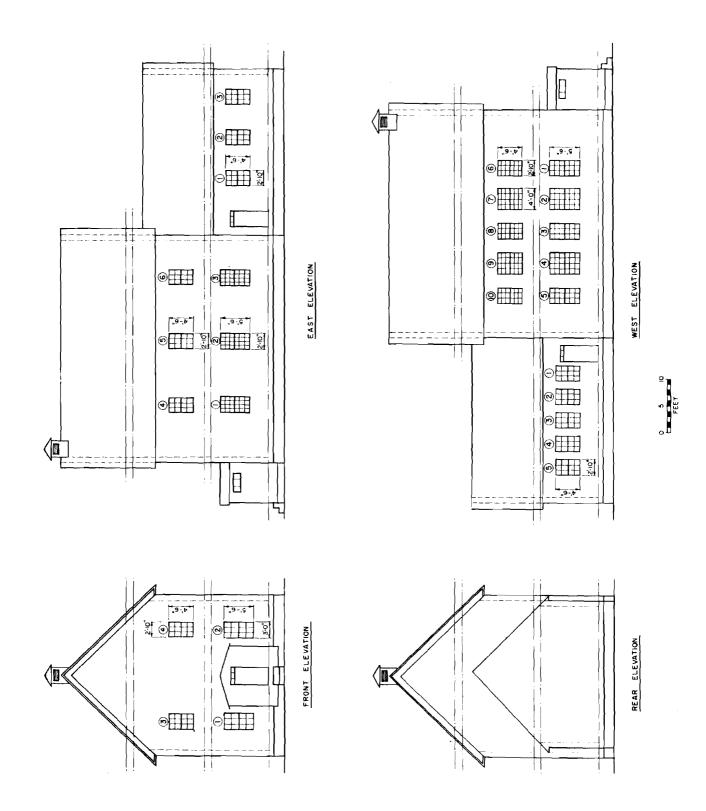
BUILDING No. 8 - TWO - STOREY SOLID BRICK
